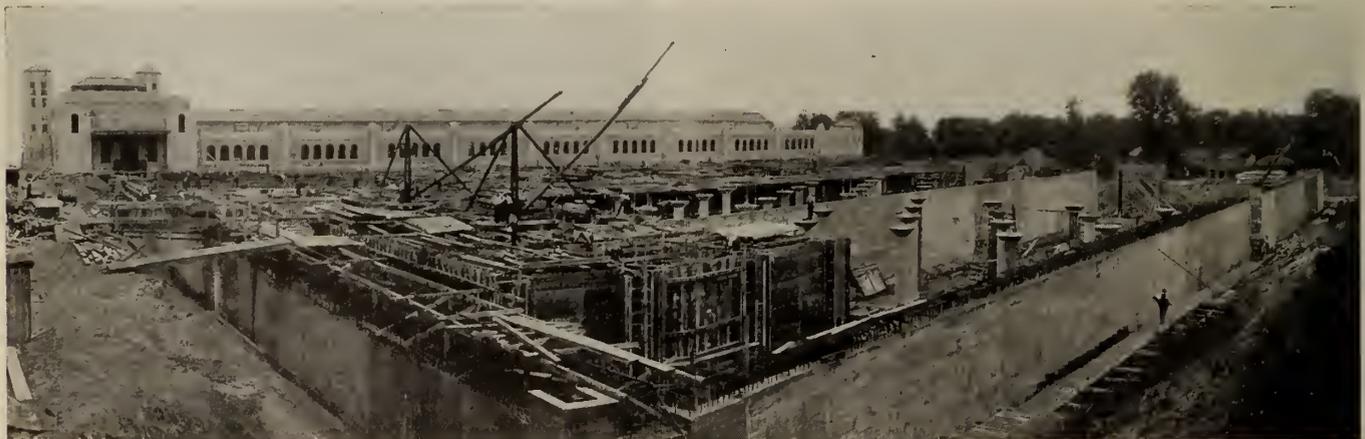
Northerly Elevation of Victoria Park Filter House, Toronto. Mixing and Settling Tanks in Foreground.
